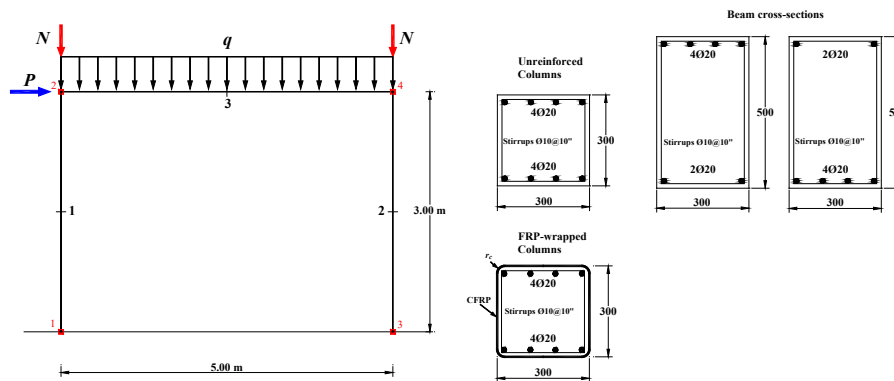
Single-bay frame structure: geometry and cross-sections of beam and columns (unwrapped and FRP-wrapped case).
